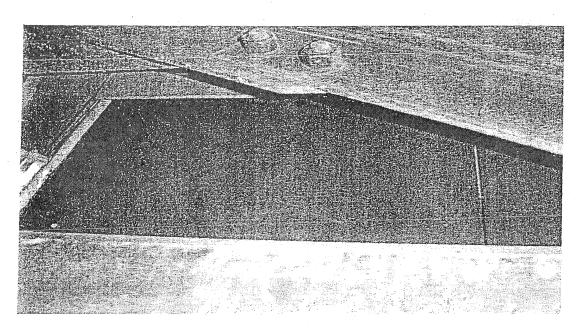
Cable Access Level, Outer Portion, Northeast Wall, Interior Face of IMP Siding.
